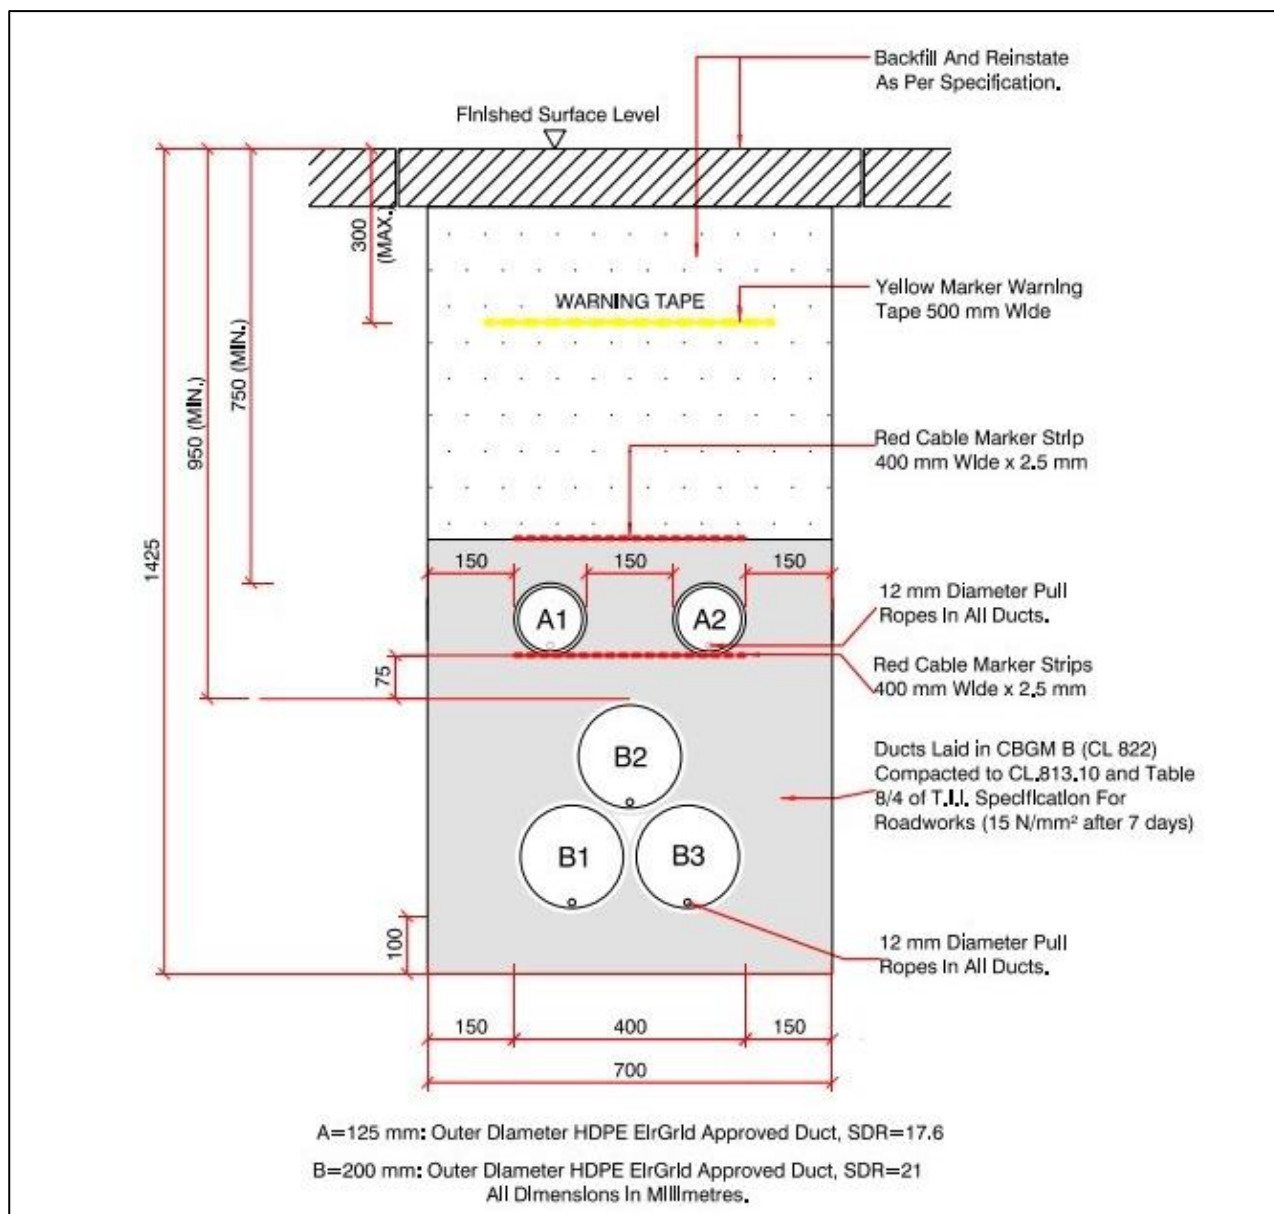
Typical Onshore Cable Arrangement Section (not to scale).
